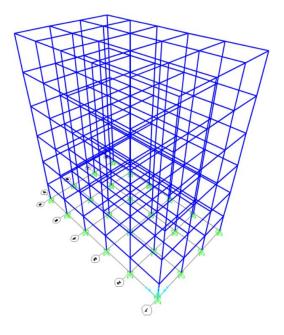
SAP 2000 model of five storied RC frame building with no basement
